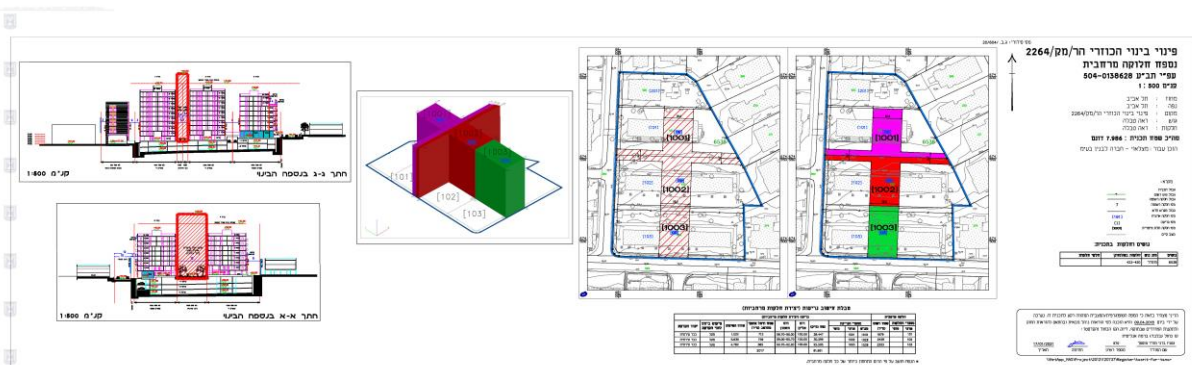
3D Plan Appendix Of the "New Division" town plan
